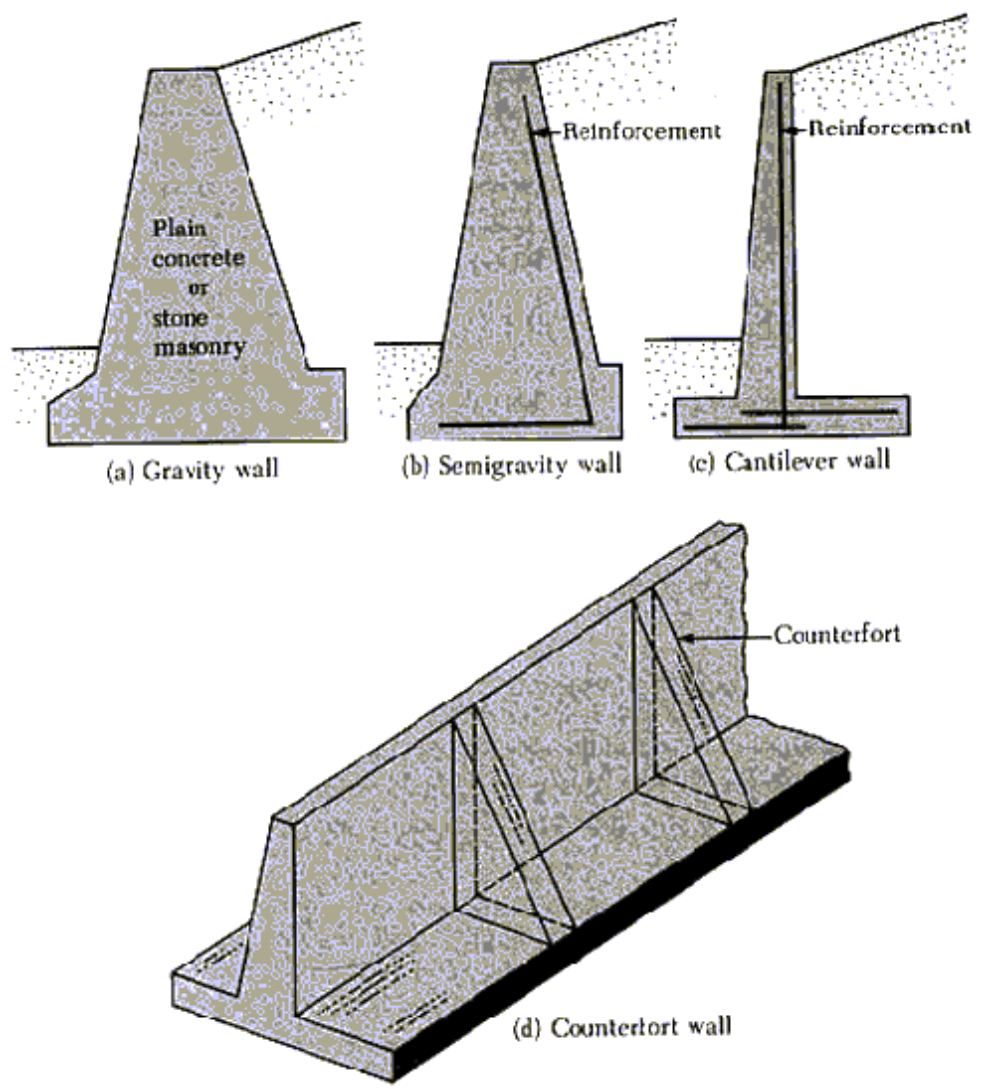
Common Concrete Retaining walls (Girard, 2012)
